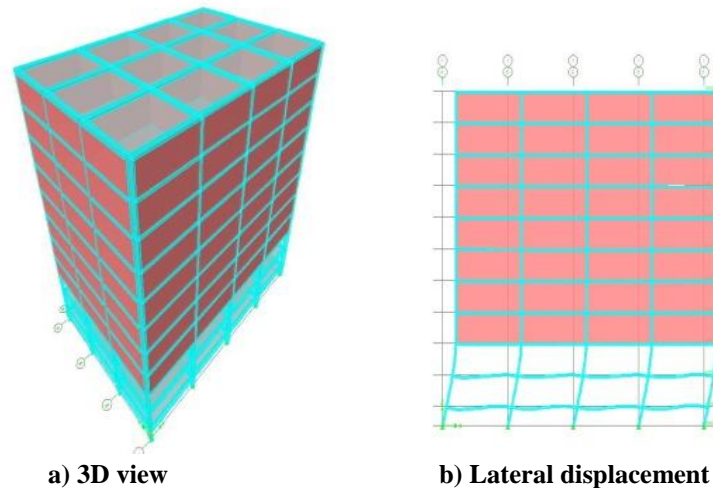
Model6: G+10 RC three soft storey building with slab element
